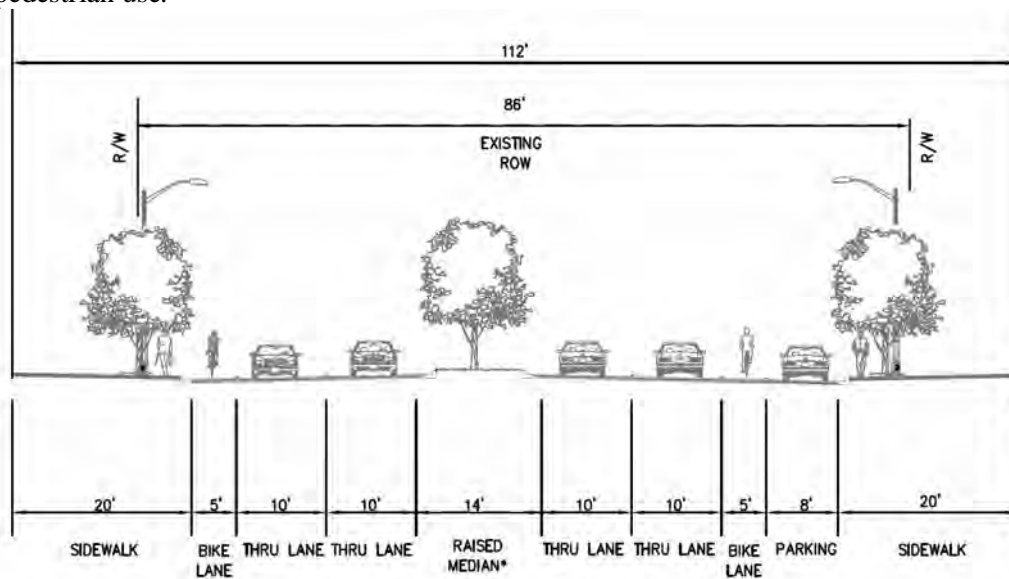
Proposed Cross Section, H Street Between Third Avenue and Broadway
